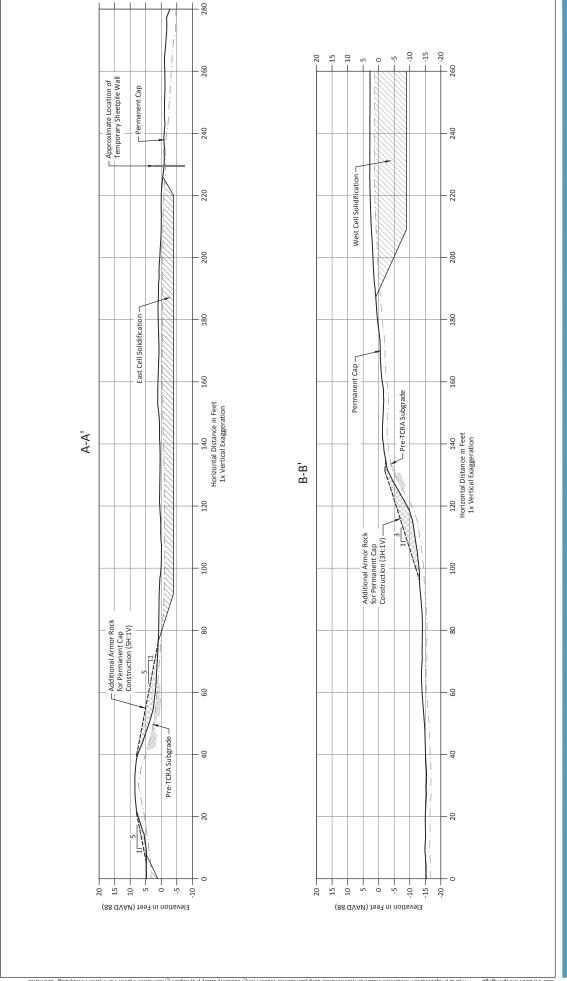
Cross Sections A-A' and B-B' - Alternative 4N Feasibility Study San Jacinto River Waste Pits Superfund Site
